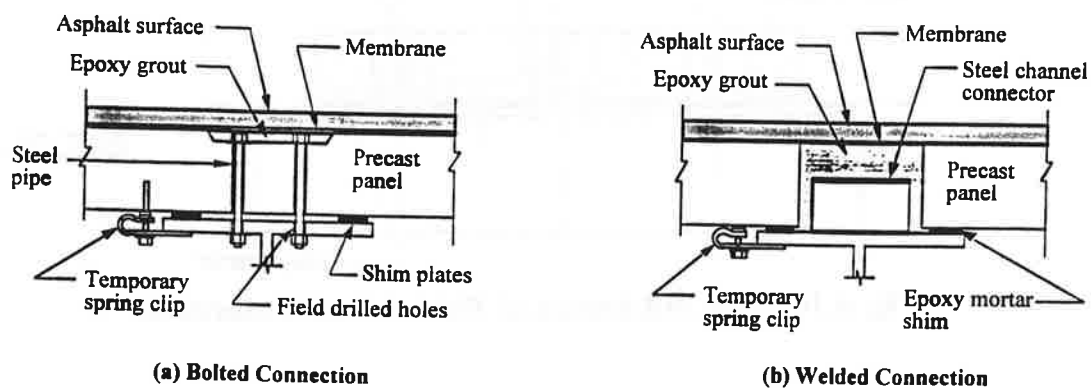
Connection Details for New York Thruway Experimental Bridge
